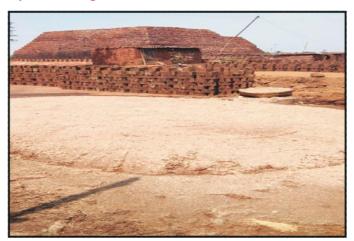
Bagasse dust is mixed with soil mud for manufacture of soil bricks.
